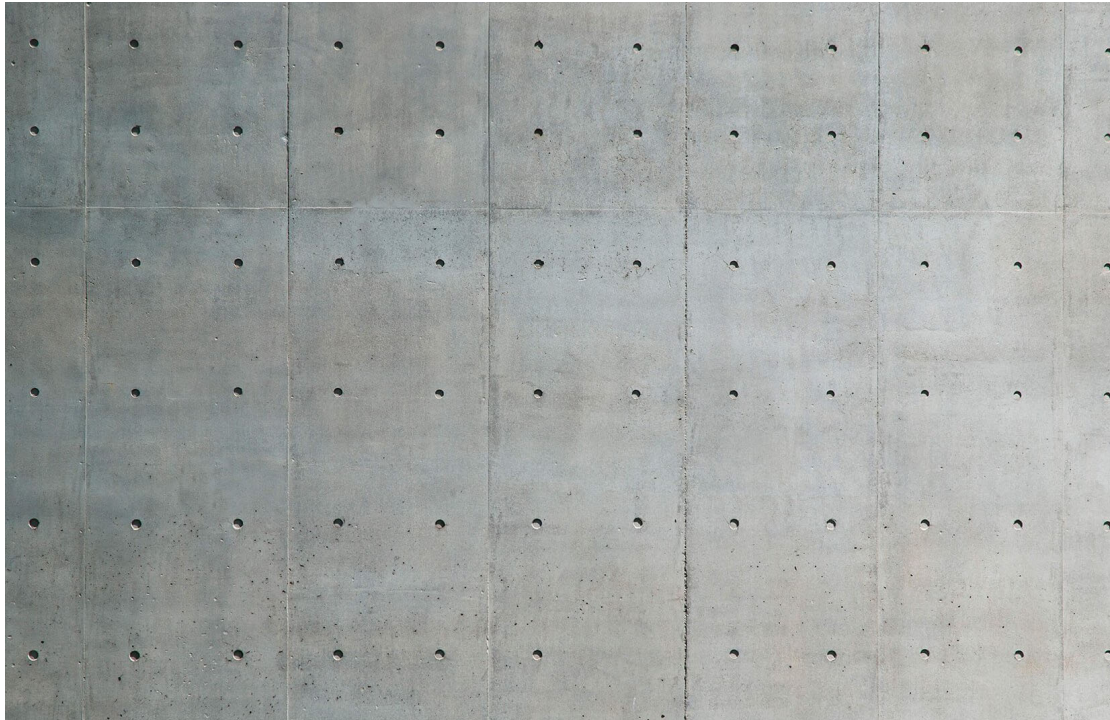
Tie Hole Texture (*Concrete Wall with Tie Hole Texture*, n.d.)
